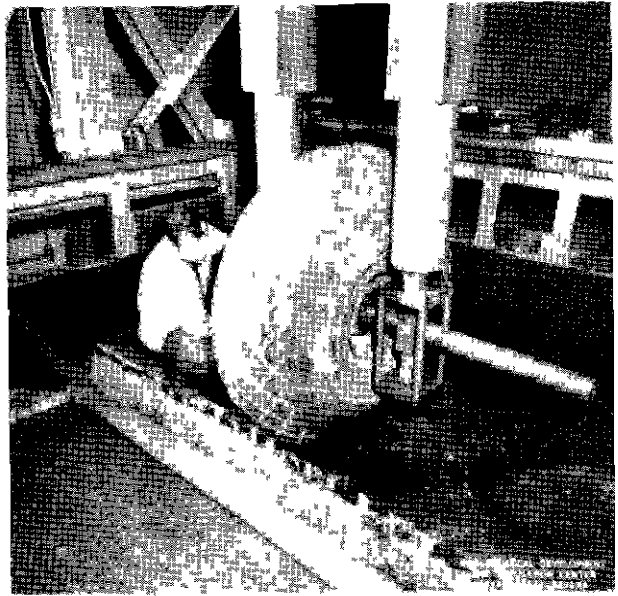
Cutaway Section of Pavement With Tire in Position for Loading
